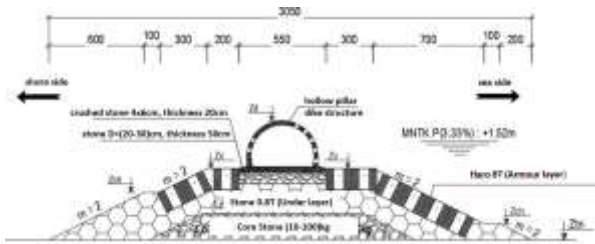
Typical cross-section of the sloped roof breakwater with Haro protection layer, combined with hollow pillar dike
